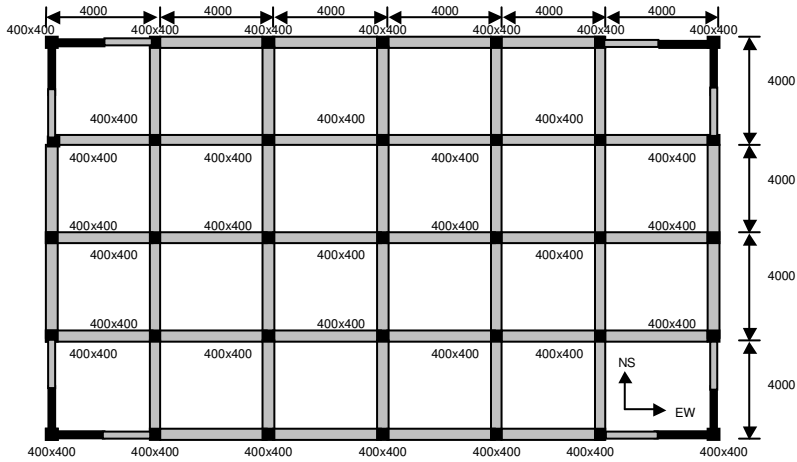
Floor plan of Shearwall Building (in mm) (Ozturk 2003)
